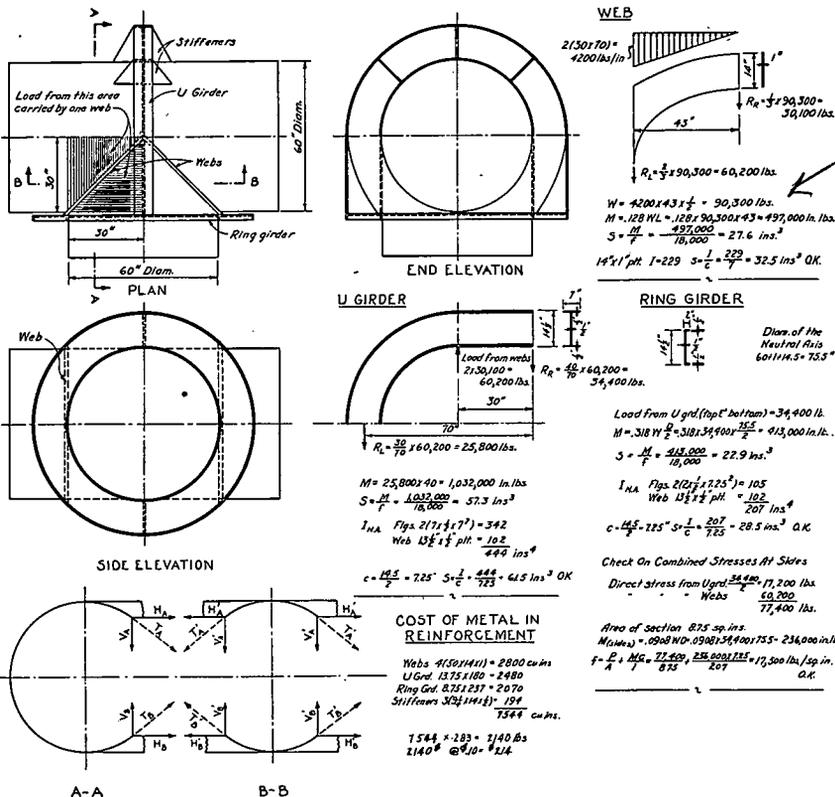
TEE, STRUCTURAL REINFORCEMENT.
